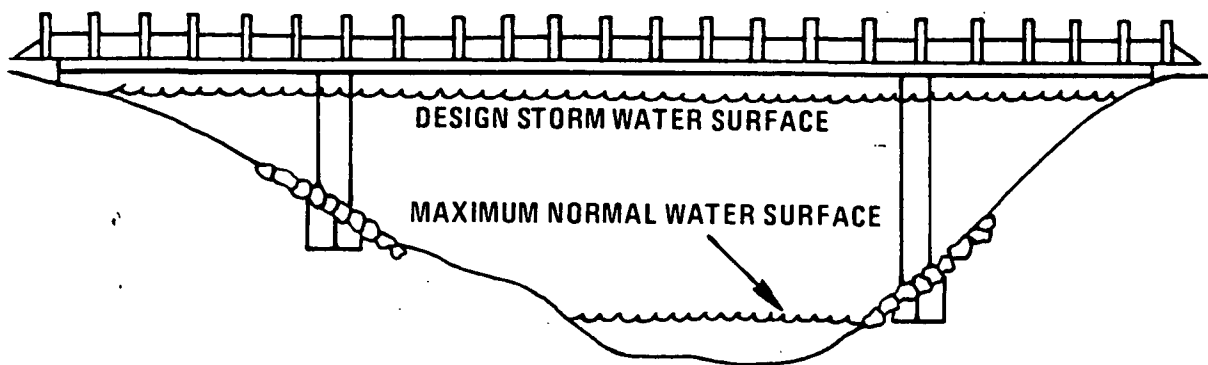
Stream Crossing With No Construction Required In The Normal Channel
